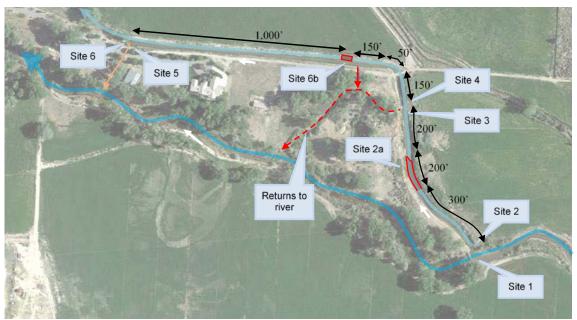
Layout of the proposed upgrades to the Fox Mickey Canal
